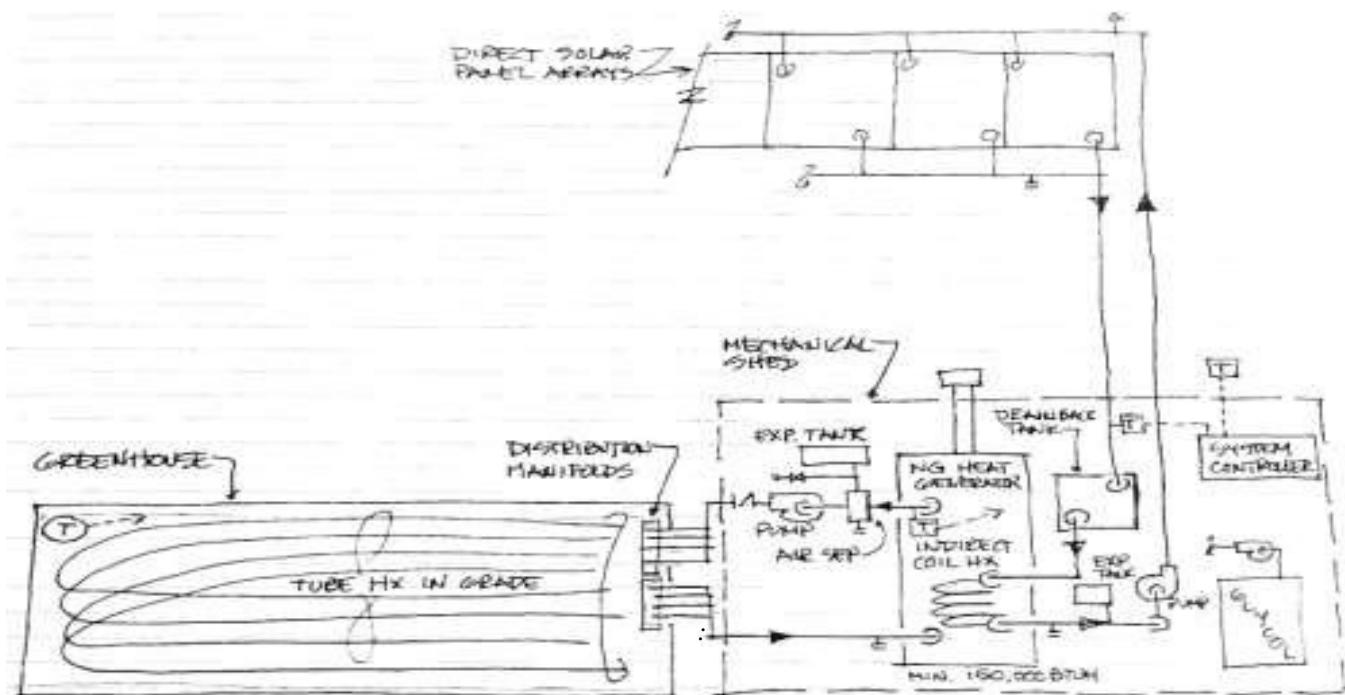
Proposed System Flow Diagram. (Source: Greenhouse owners)
